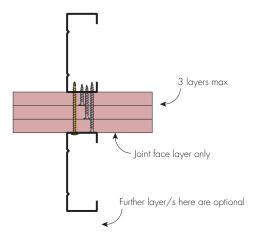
Fire Rated Ceiling Configuration Fire rated from above (Built from underside only)
